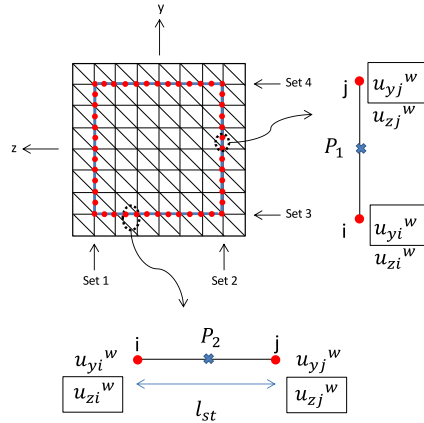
Cross-section discretization: concrete and transversal steel reinforcement mesh
